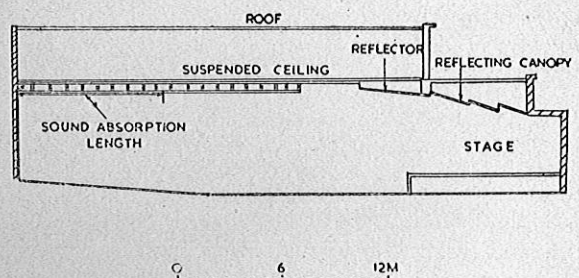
Section of Sapru House, New Delhi, showing suspended reflectors over the proscenium. Rear portion of the ceiling is acoustically treated. The hall is rectangular in plan and the acoustics is considered "very good", particularly when column type loudspeakers are used.
